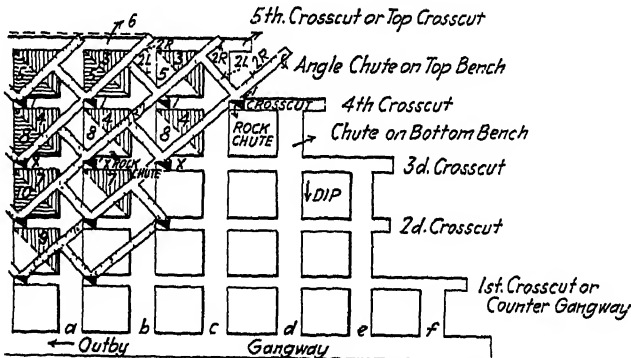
DETAILS OF PILLAR DRAWING WITH ANGLE CHUTES, BIG BEN SEAM, CARBONADO.
